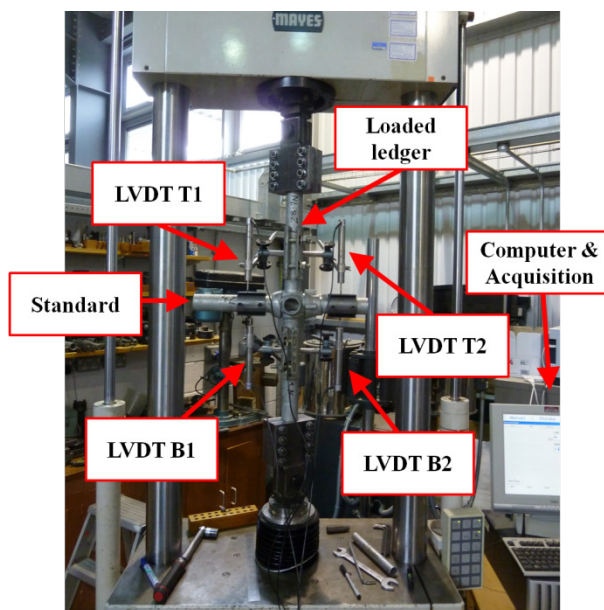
Setup for the tensile axial test of the ledger-to-standard joints.
